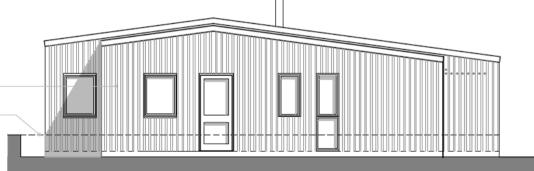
Extracts from STE21S-01-01-107B Proposed Floor and Elevation Plans (Source: CB3 Design Architects).
